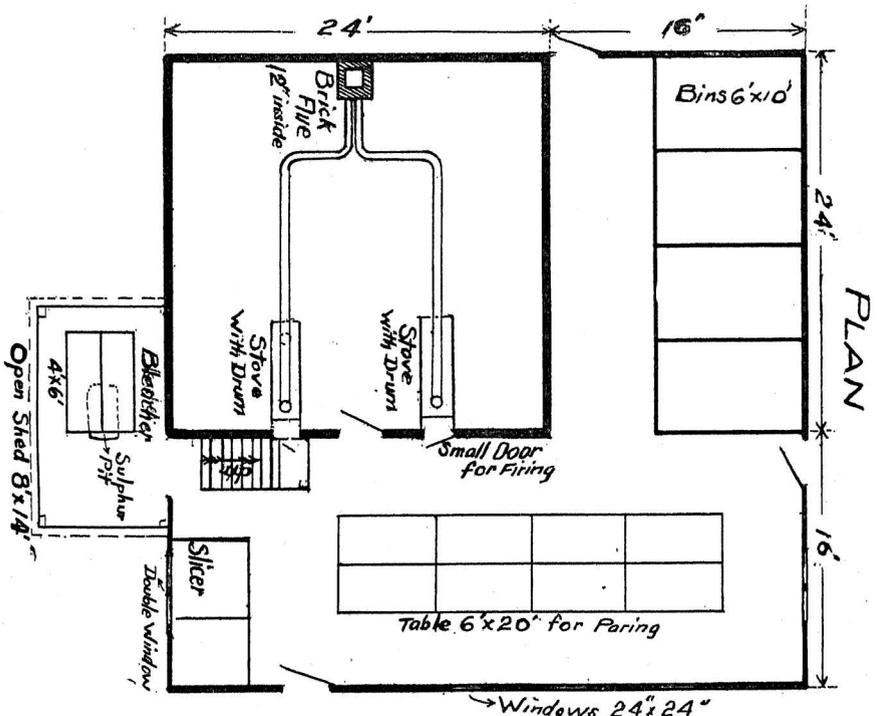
FIGURE III. FLOOR PLAN, SHOWING LOCATION OF STOVES, ARRANGEMENT OF PIPES, APPLE BINS, PARING TABLES, SLICERS, ETC.
